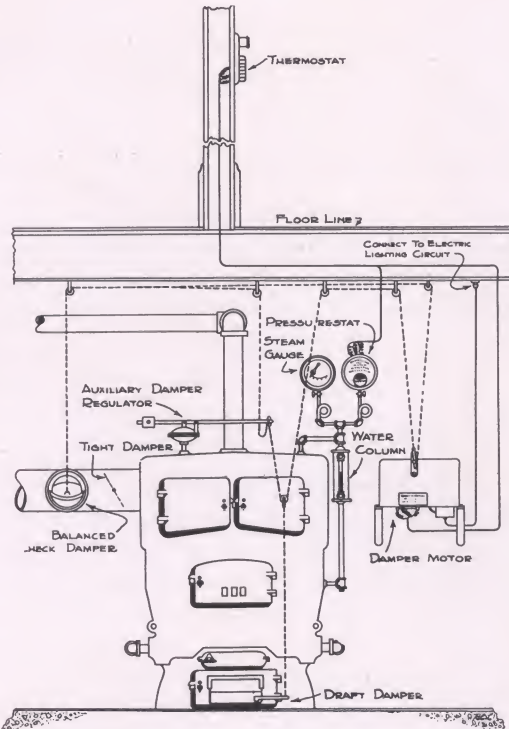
Method of Installing Damper Chains (One Boiler)
